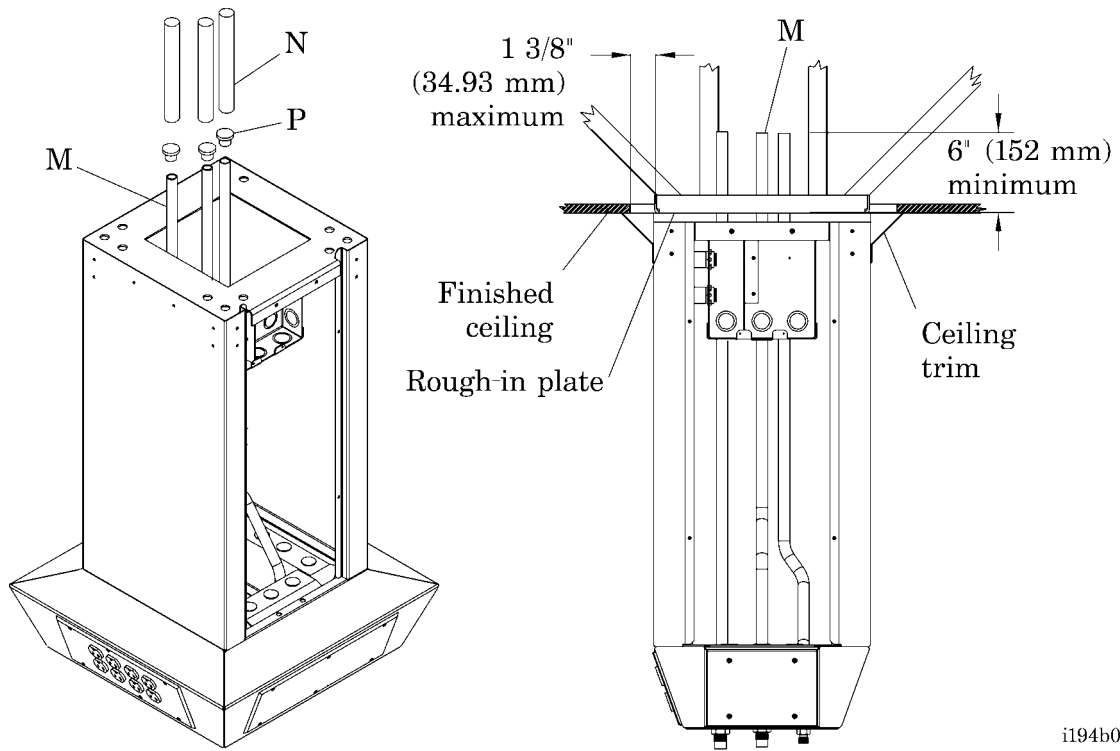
Ceiling Column to Rough-in Plate Installation
